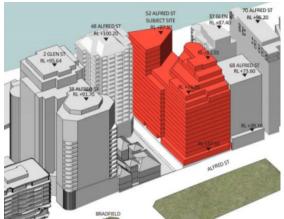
Originally proposed building envelope (from Alfred Street South)
